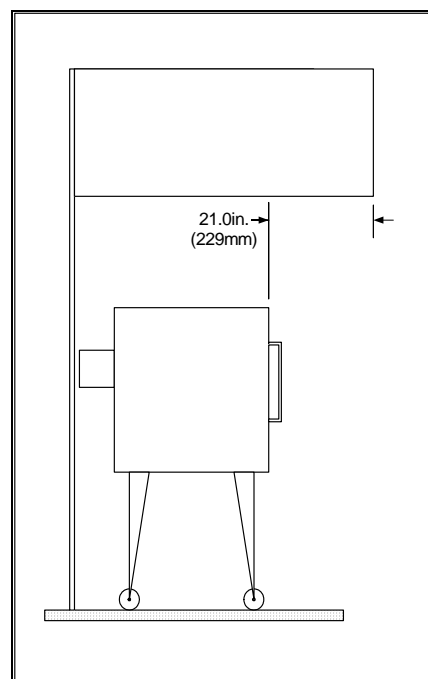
Line Drawing of 21.0 inches of Front Overhang for the Full-Size Oven Using a 5-Foot Deep Hood
